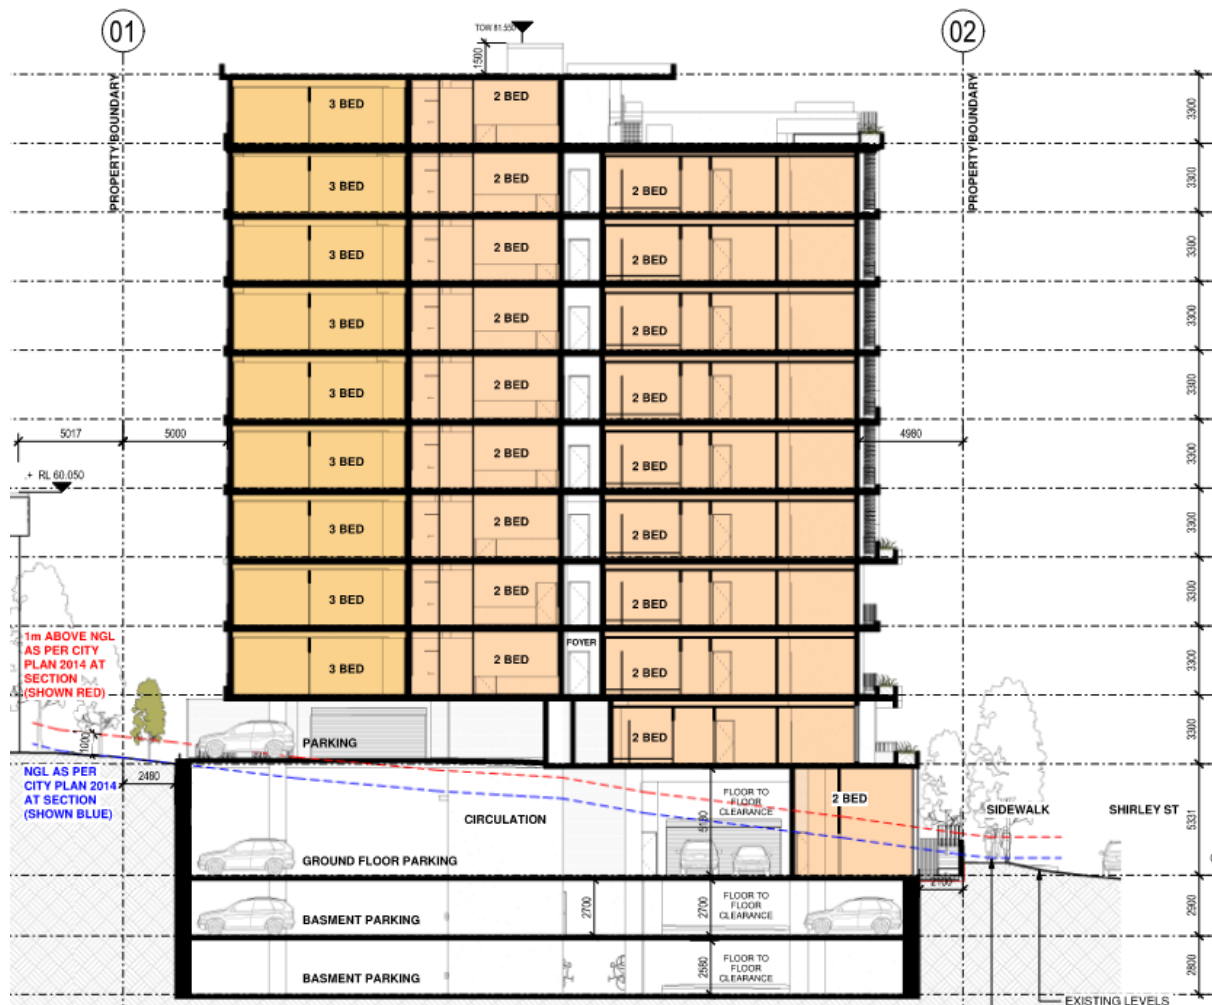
Section of proposed building to demonstrate reduced floor-to-floor heights and ultimately reduce the overall peak building height.
